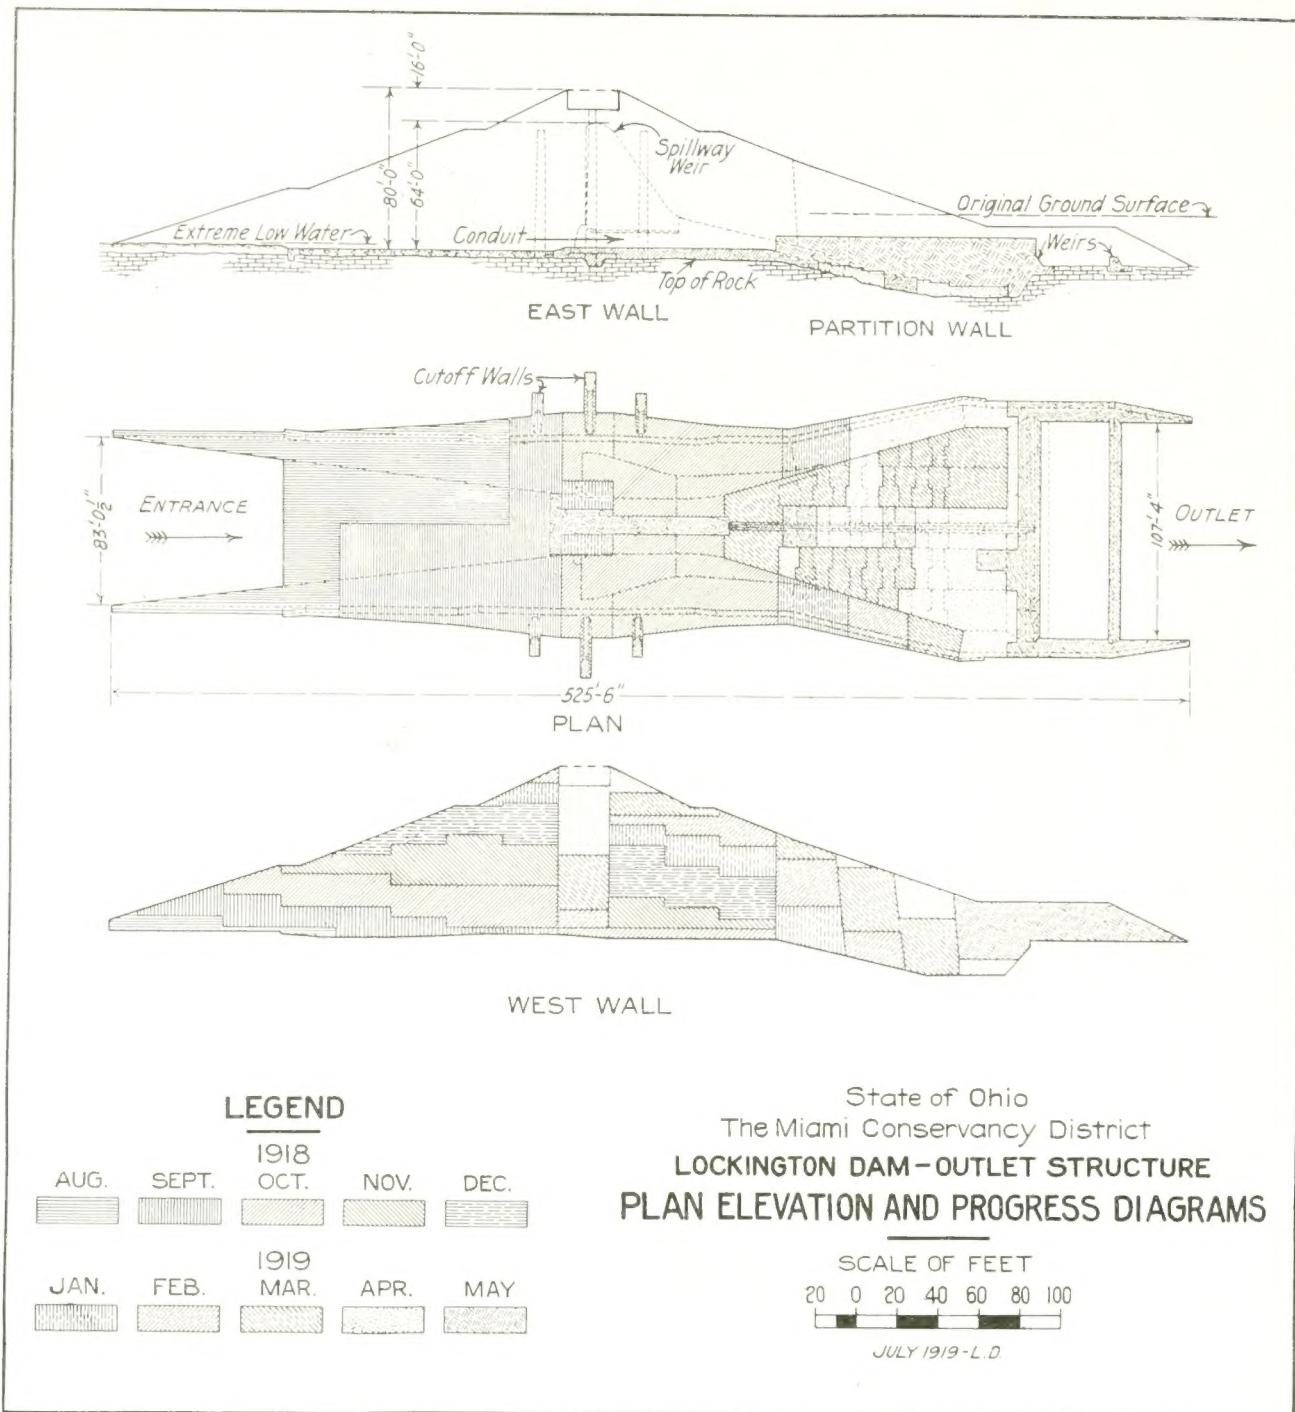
PLAN, ELEVATION AND PROGRESS DIAGRAMS OF LOCKINGTON OUTLET STRUCTURE.
